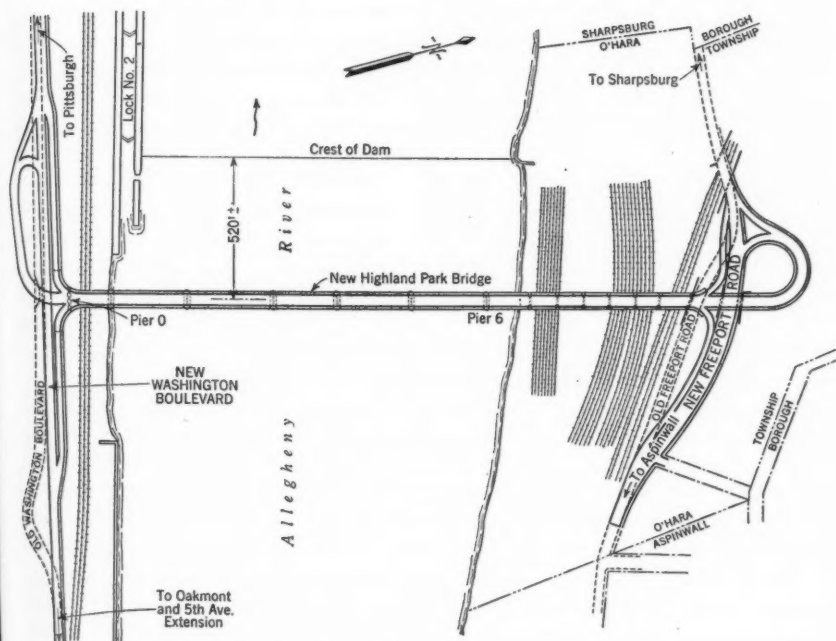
HIGHLAND PARK BRIDGE AND CONNECTIONS, ALLEGHENY COUNTY, PENNSYLVANIA
